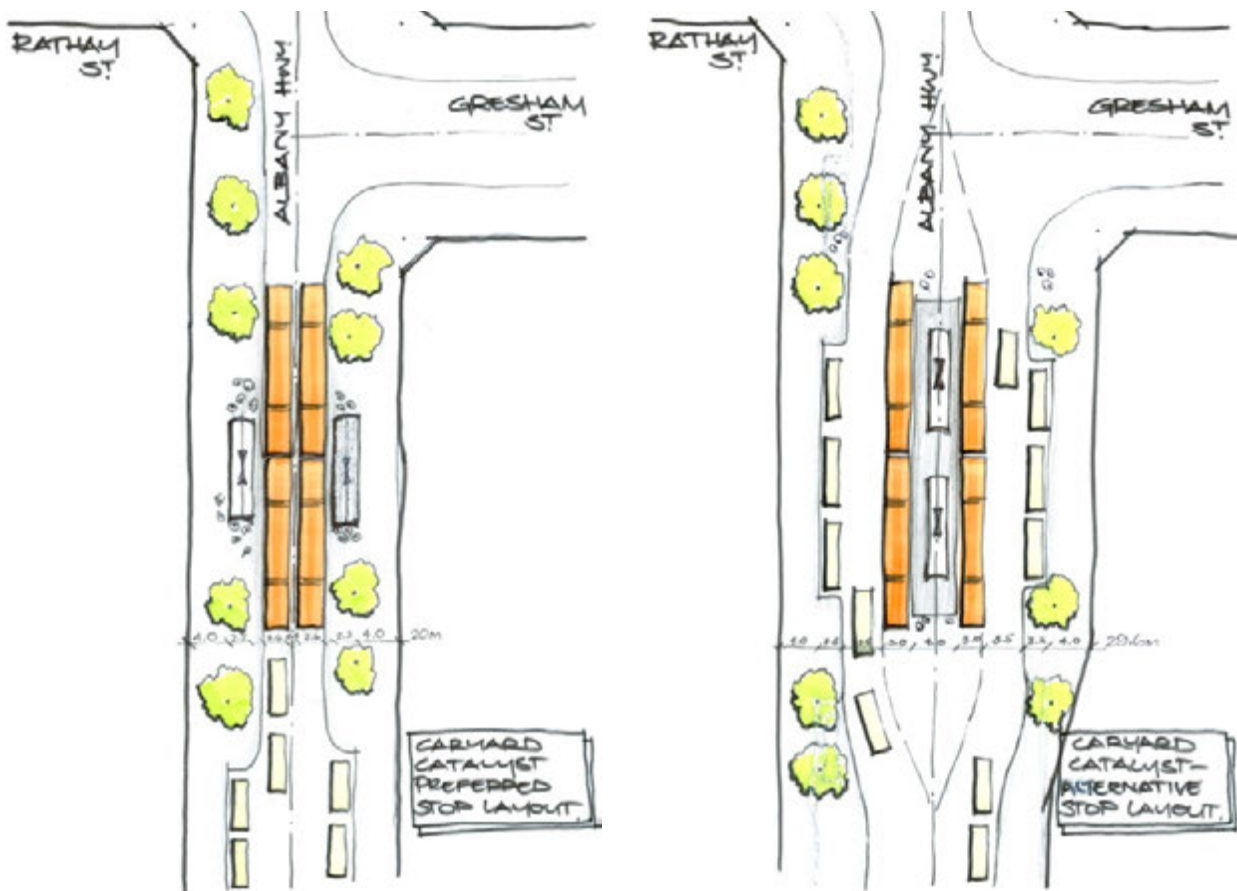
Proposed Gresham Street - State Street Station Layout Alternatives
